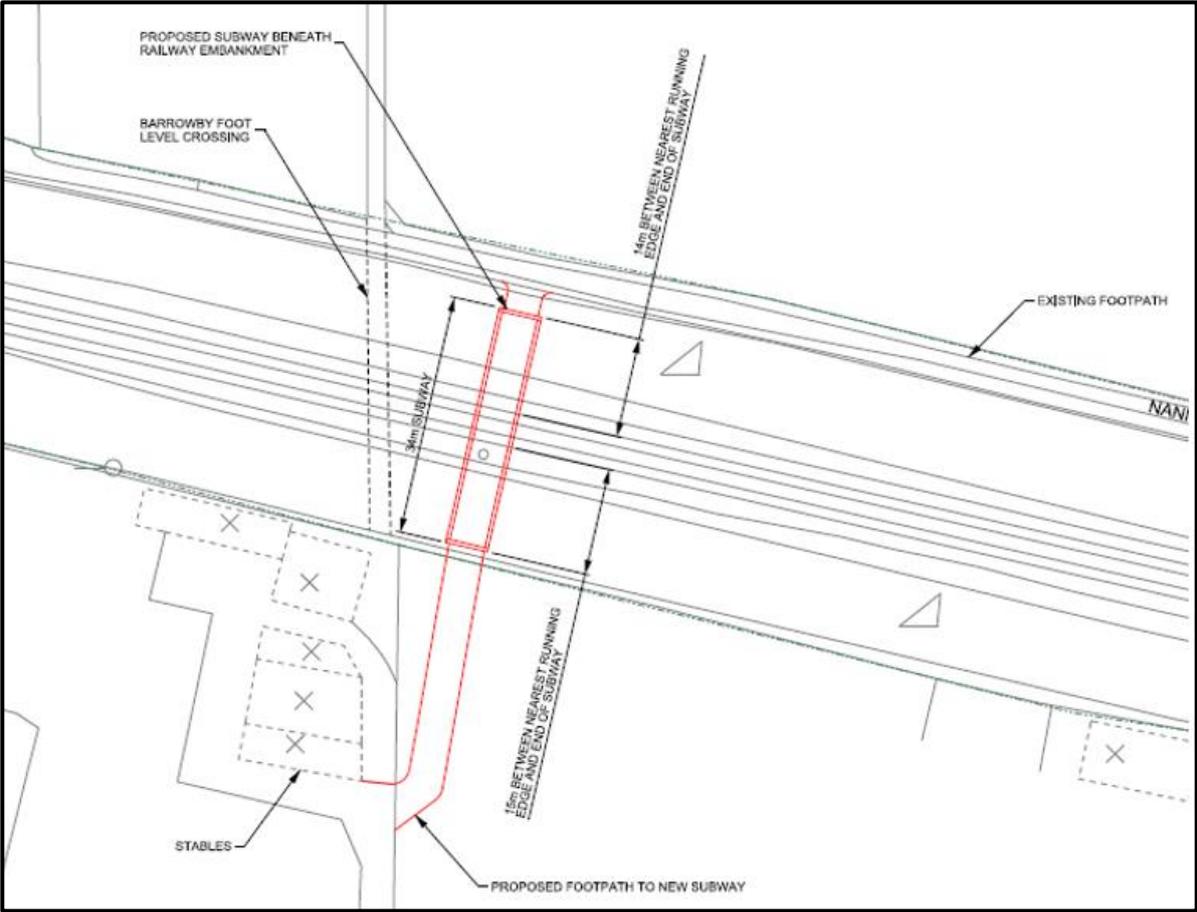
Option 2 – New subway at Barrowby Foot Level Crossing
